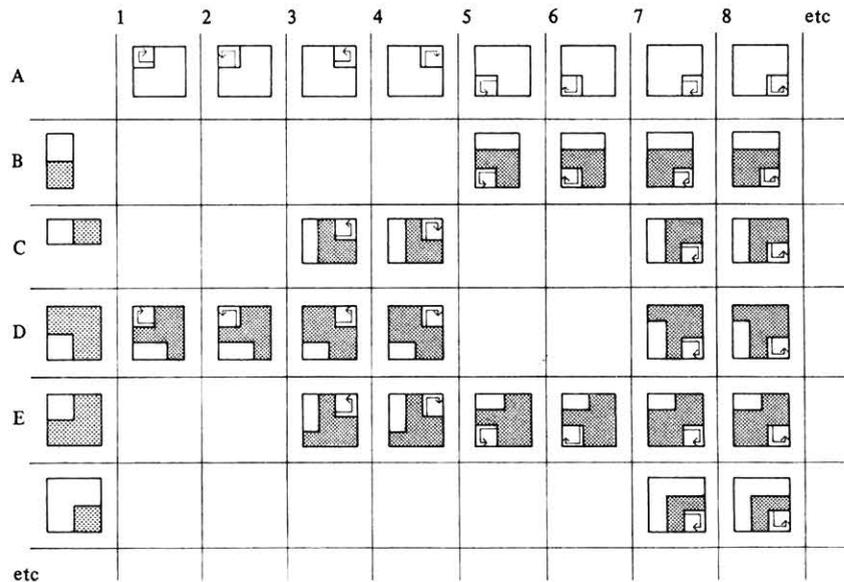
Permutations of general arrangement for the ground floor plans of small houses, from a study of adaptability by Bailey (1977). The houses are two-storey, nominally 'five person' with at least three bedrooms. The ground floor comprises in each case a dining room, kitchen, living room, hall, wc, corridor, and staircase. The first three of these are assumed to be planned within a single rectangle or two adjacent rectangles. The figure shows some examples of possible placings A, B, C, ... of these rectangles (unshaded) within the rectangular house 'shell', leaving a circulation and service area (shaded); combined with possible placings 1, 2, 3, ... of staircases—in these instances a dog-leg type.
